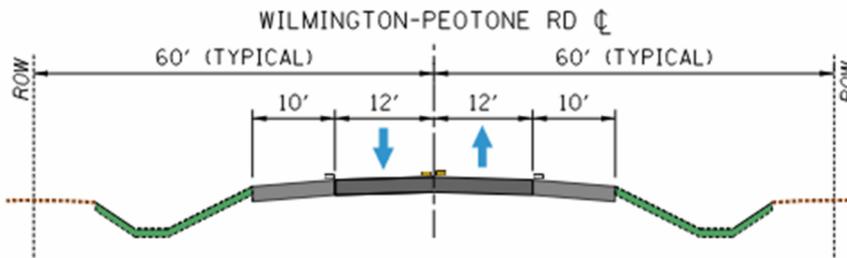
Proposed Wilmington-Peotone Road Typical Section
